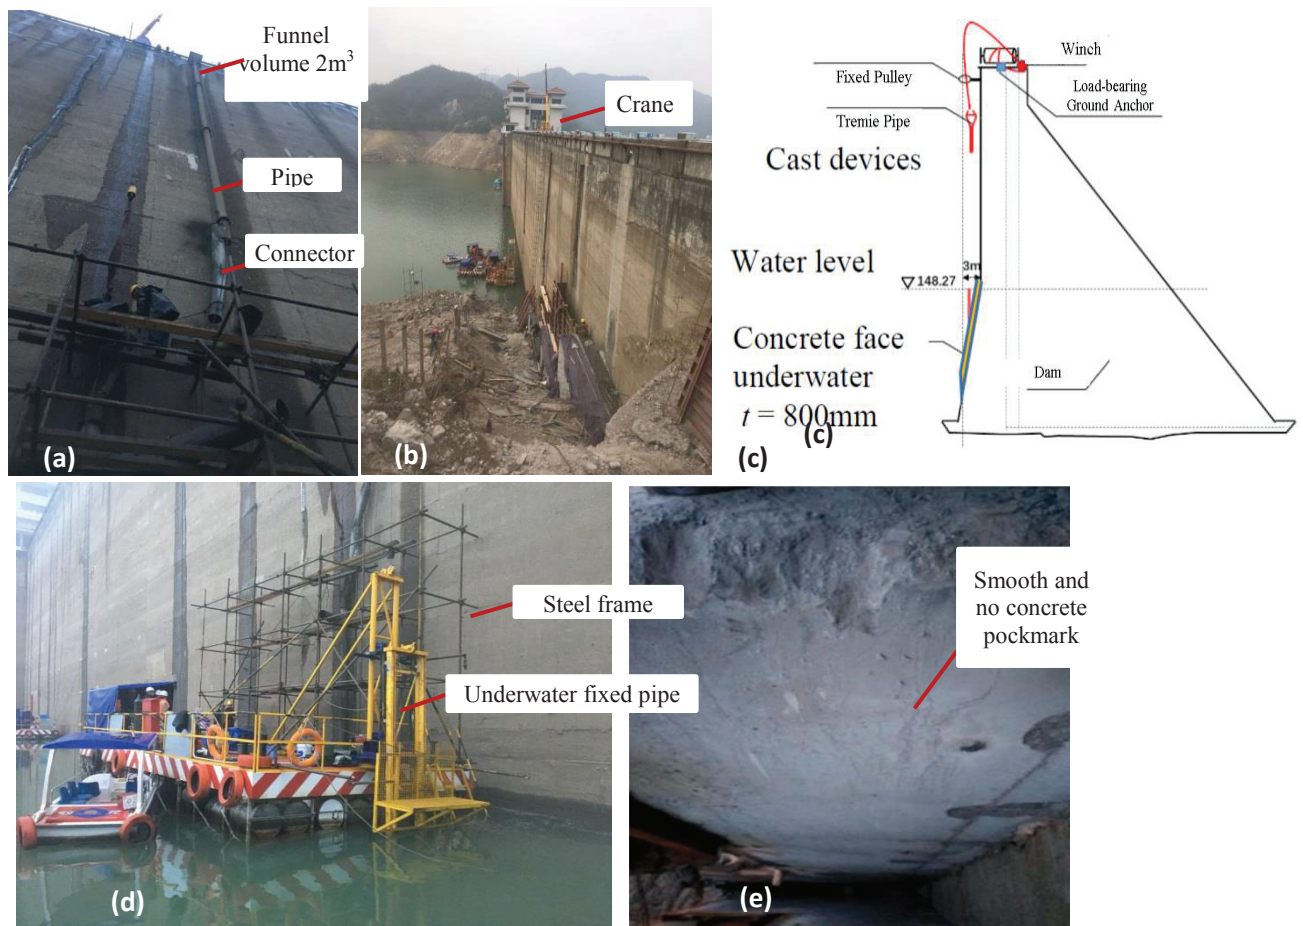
Layout of SPUC construction in Wanyao dam, casting plan during rehabilitation construction and after completion of the project
